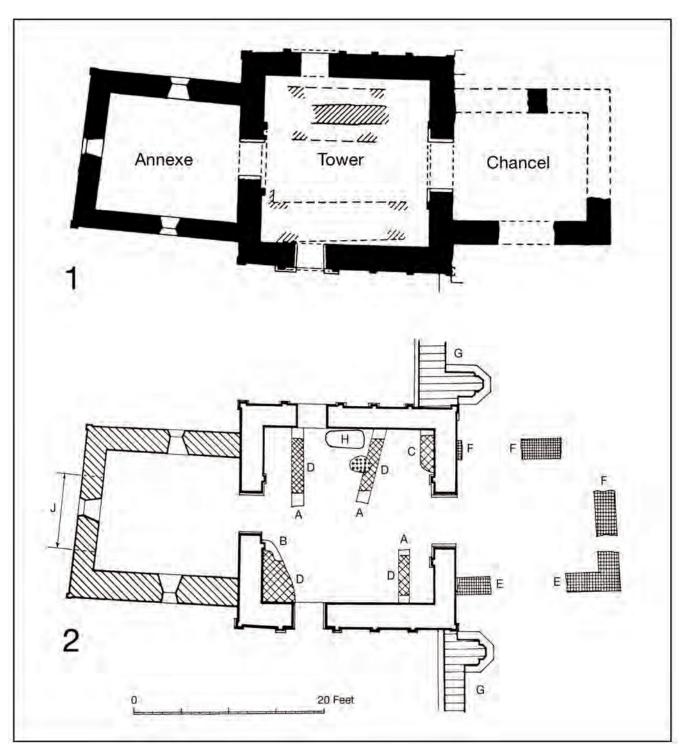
Archaeological plans of the Anglo-Saxon church. 1, interpretive drawing showing the supposed earlier foundations (hatched) under the floor of the turriform nave, based on Bilson's excavations of 1912–13. Drawn by A.W. Clapham. 2, plan showing archaeological trenches. A, excavated 1913; B, excavated 1913 and 1945; C, excavated 1945; D, mortar 'foundations'; E, foundations of chancel, seen 1898; F, foundations of chancel exposed 1951–54; G, walls of medieval aisles and arcades; H, brick-lined furnace; J, infilled west doorway. Drawn by H.M. Taylor. Clapham 1930; Taylor 1974b
